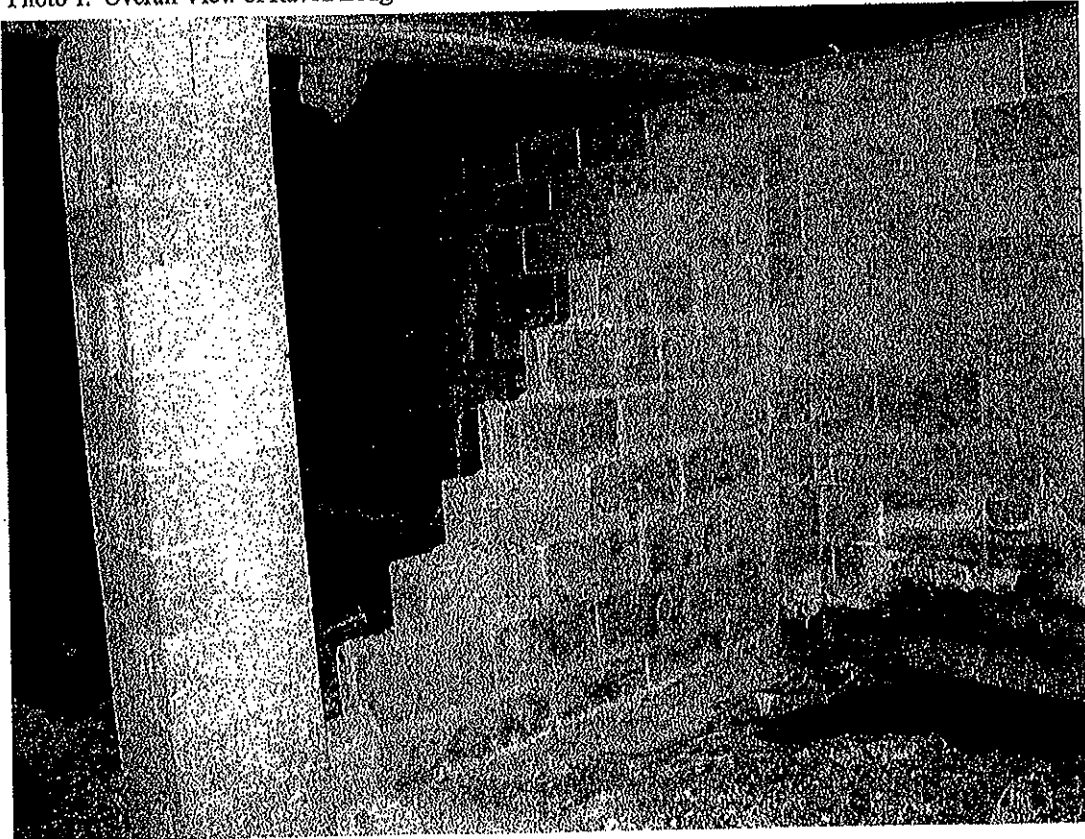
View of Crawl Space Under Raven Lodge with Added Buttress Walls
